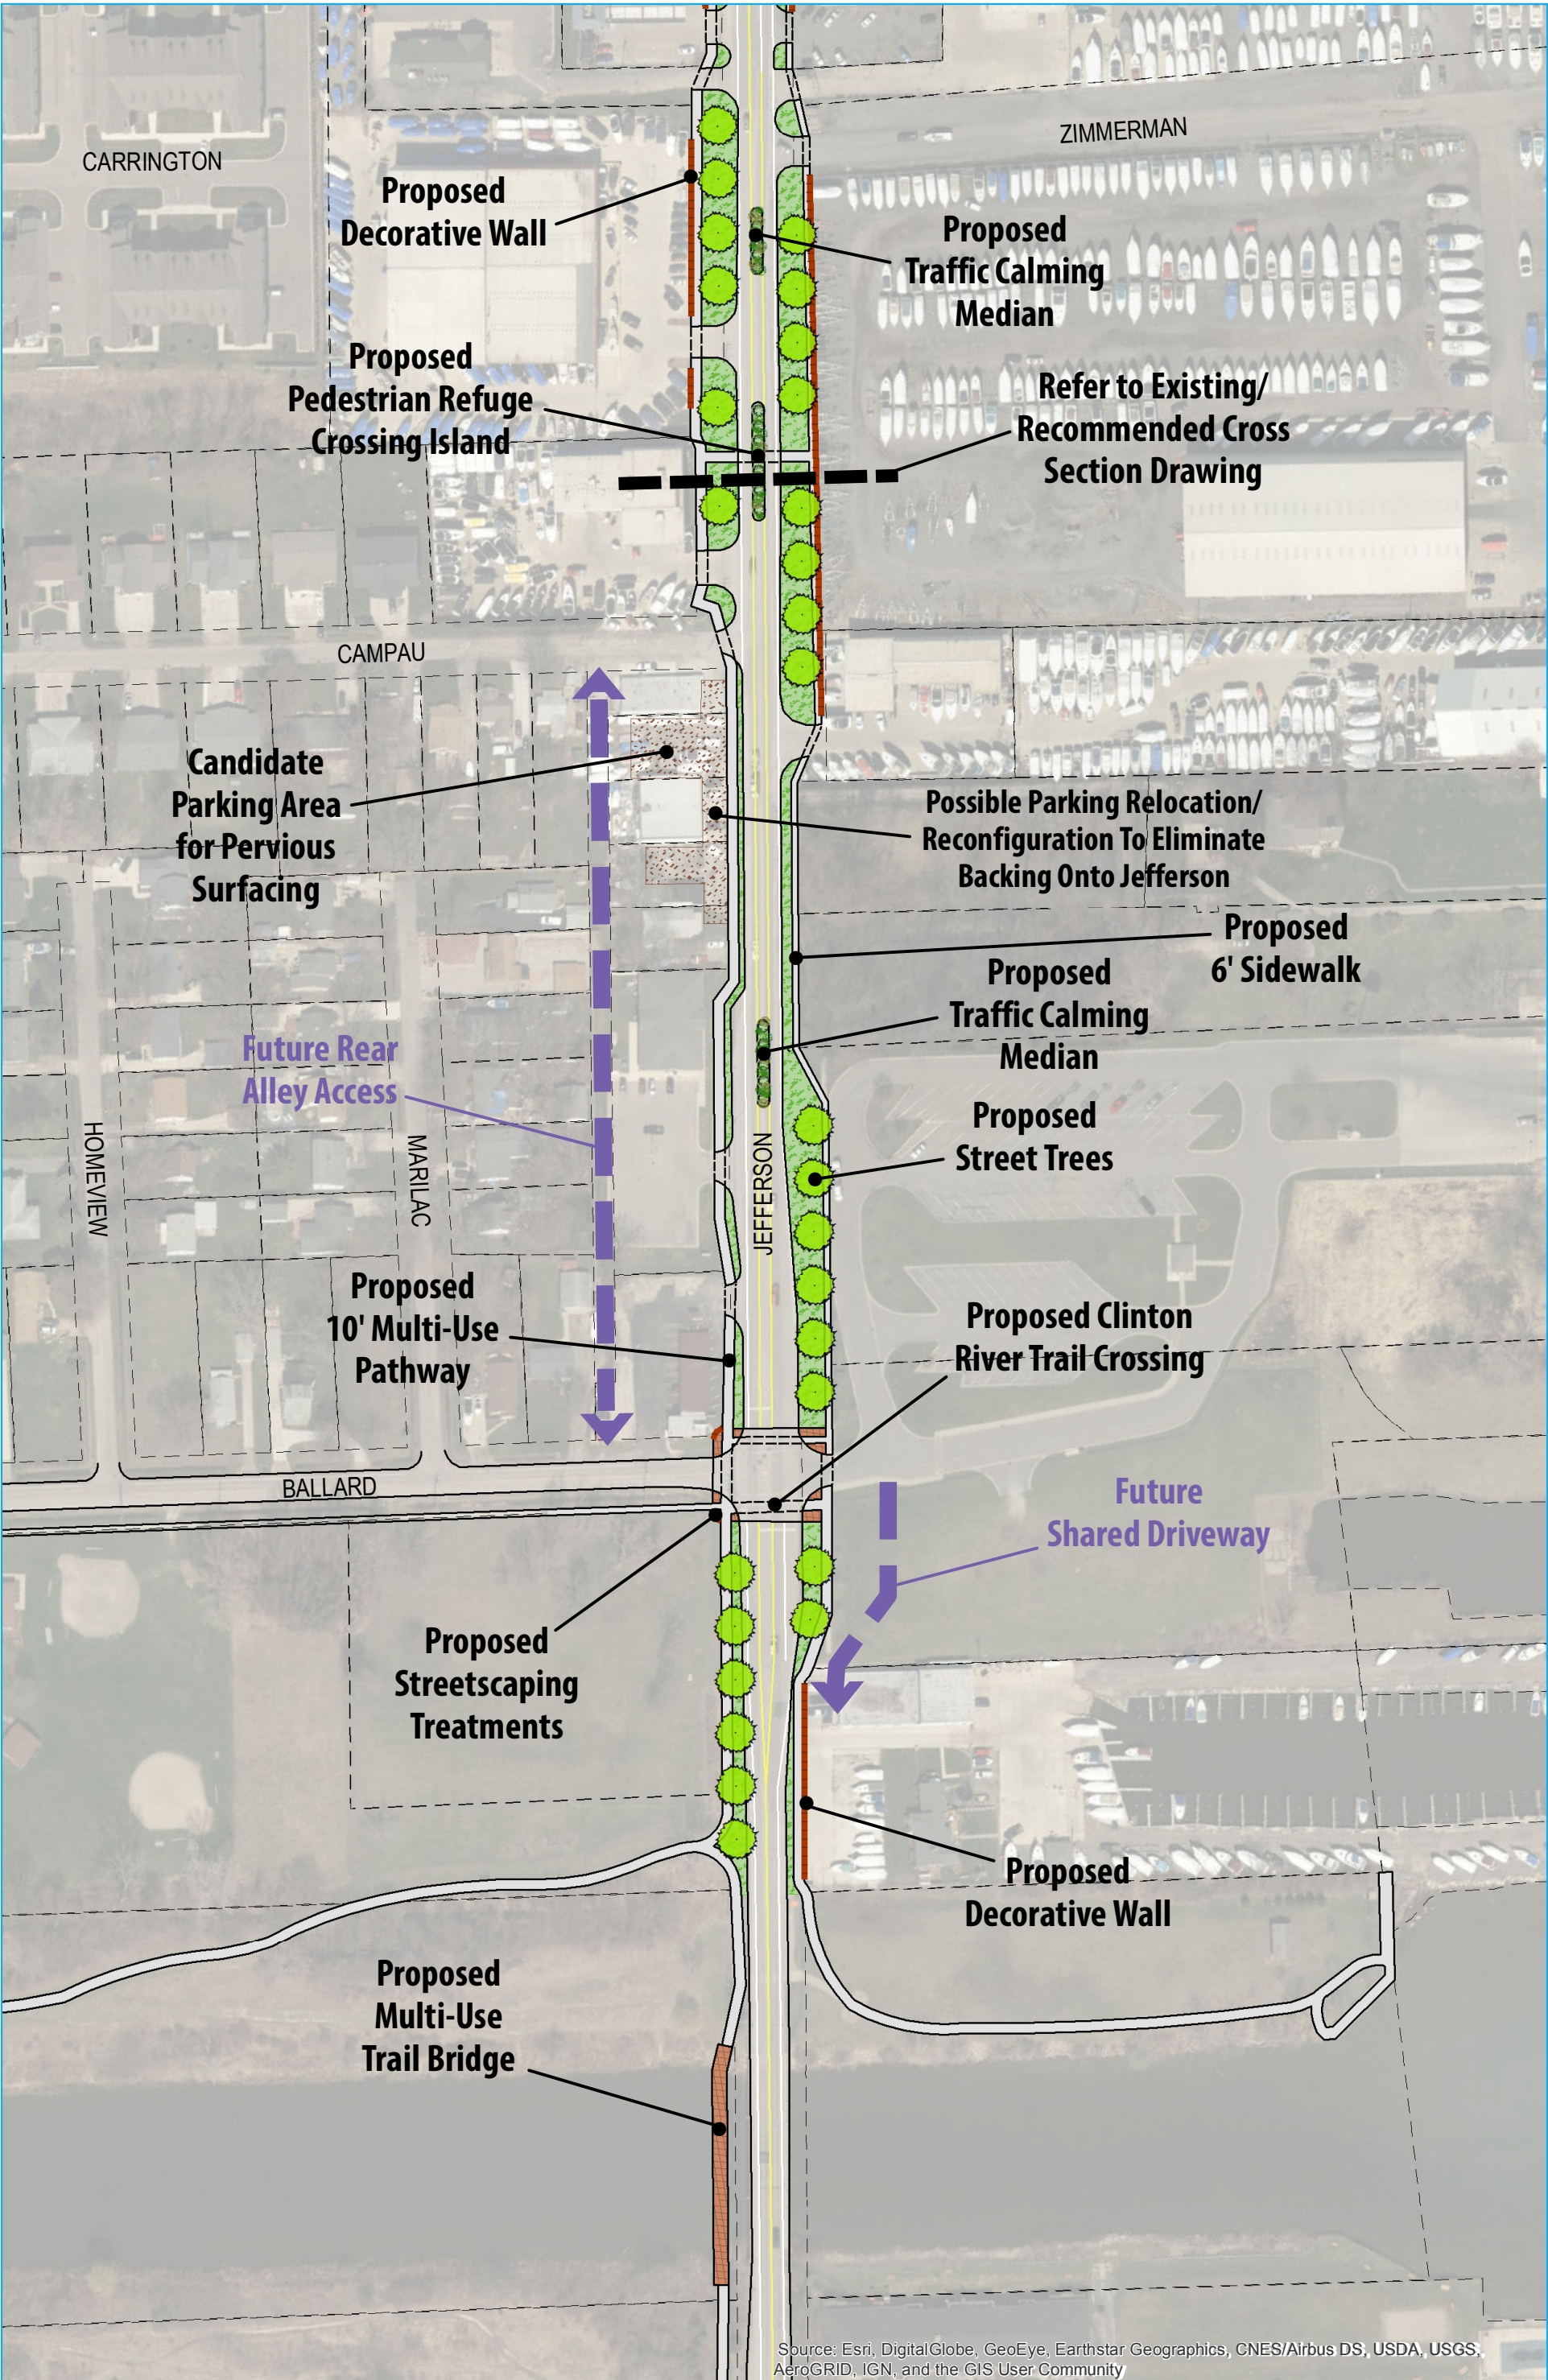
Jefferson Avenue: Recommended Complete Street Design
